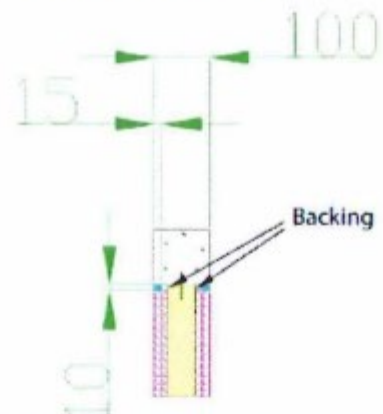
wall gypsum to stone thickness ≥ 100 mm
